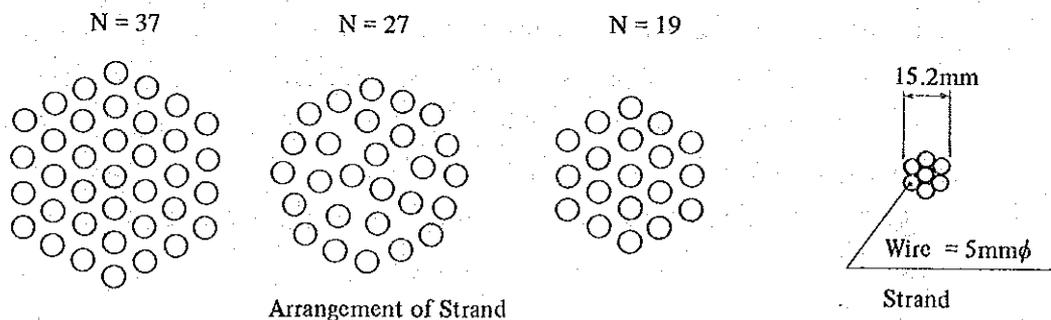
DESIGN TENSILE STRENGTH AND CROSS-SECTION OF STAYED CABLE
